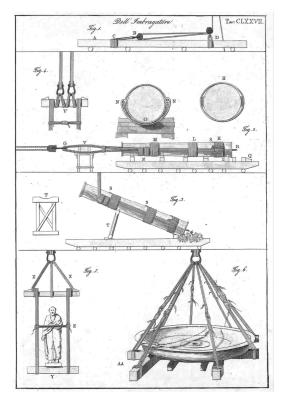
Equipment used to lift and move monolithic columns (Valadier 1832, III, fig. CLXXVII, detail)
